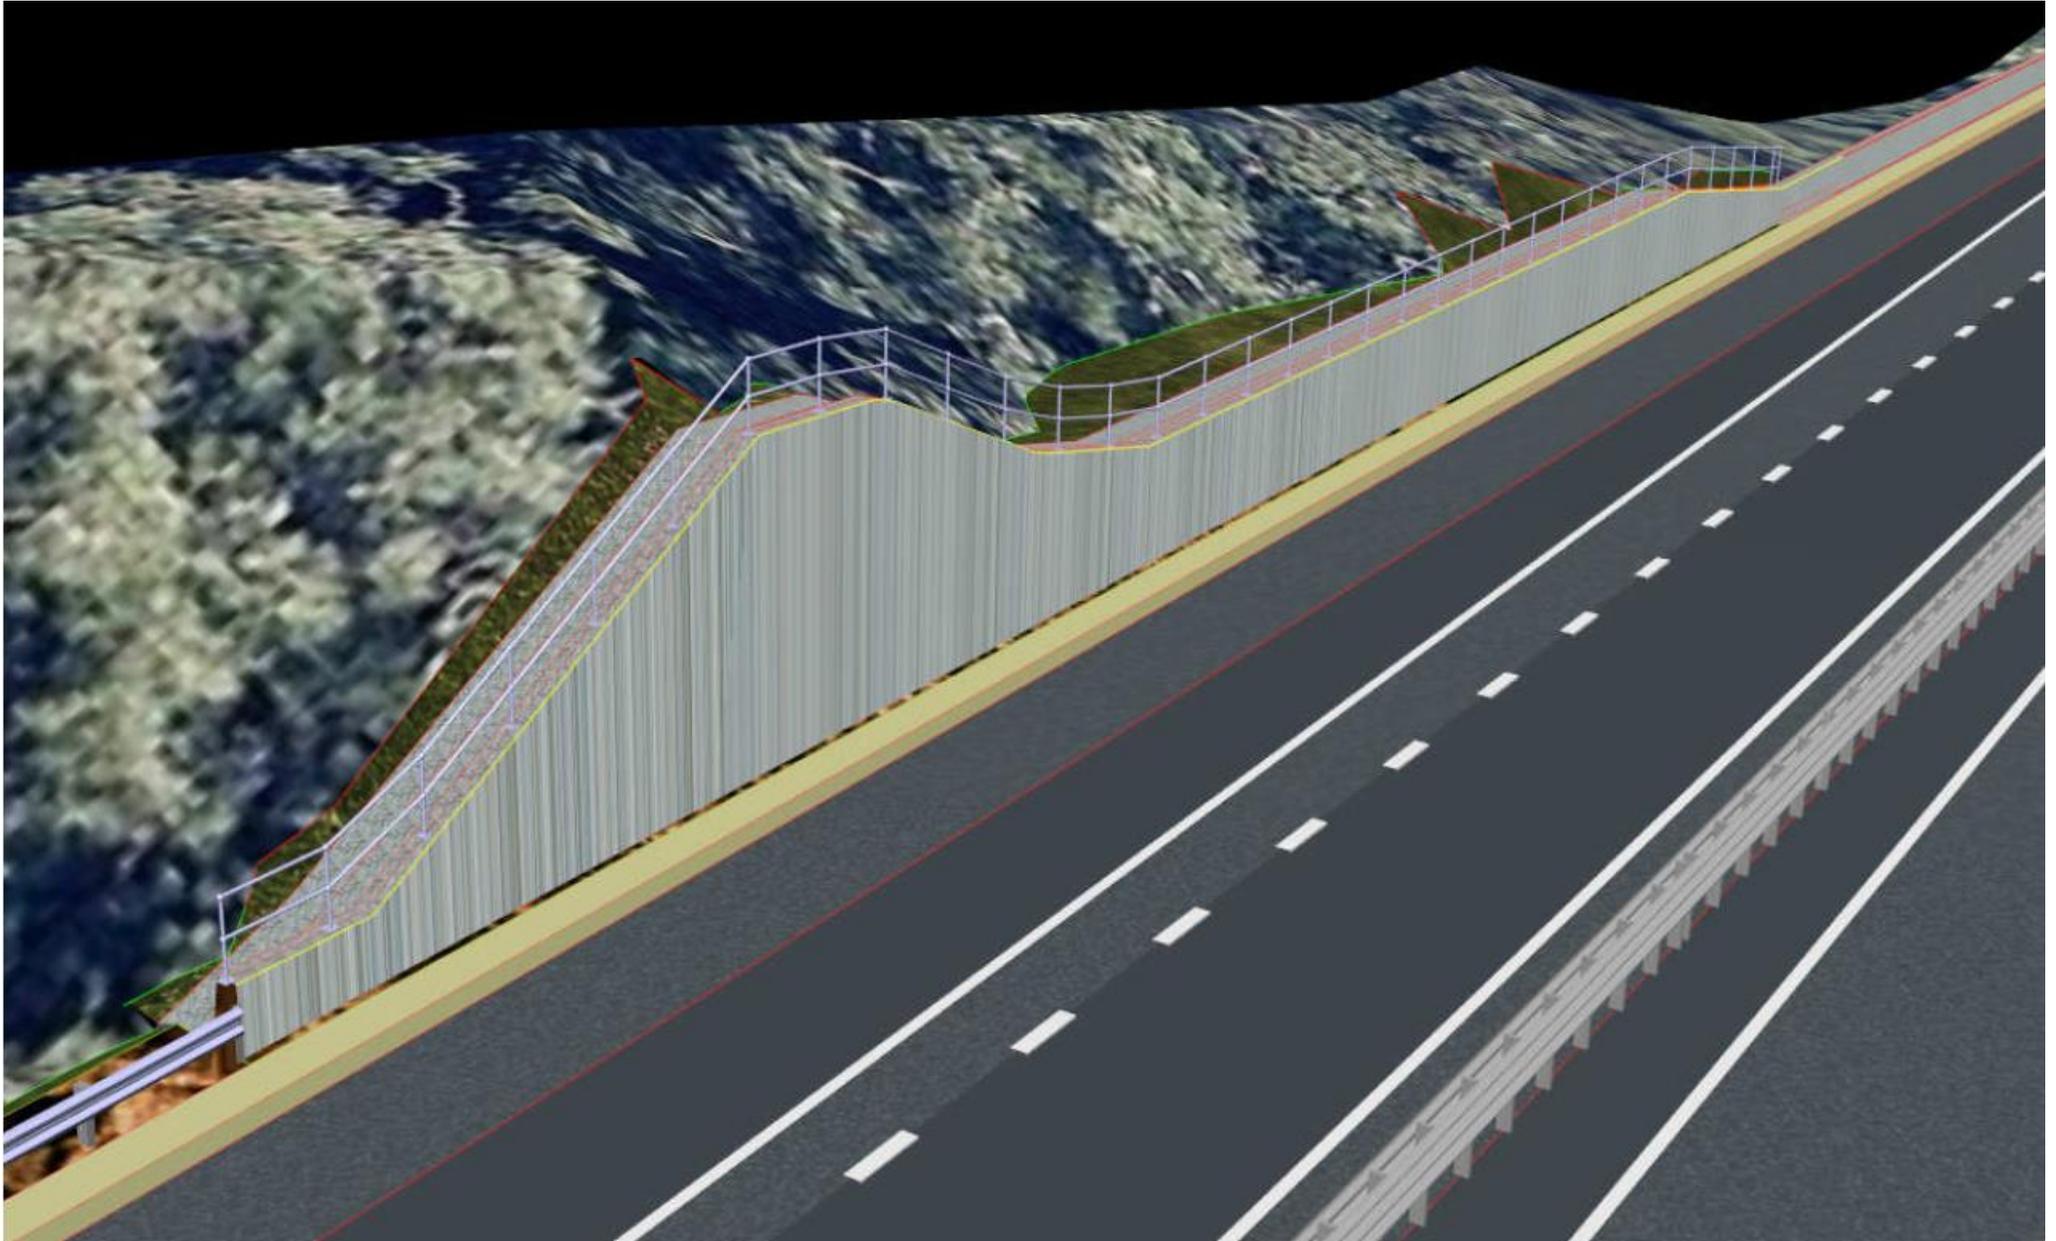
Retaining wall – MW01 Type 1 (cut)
